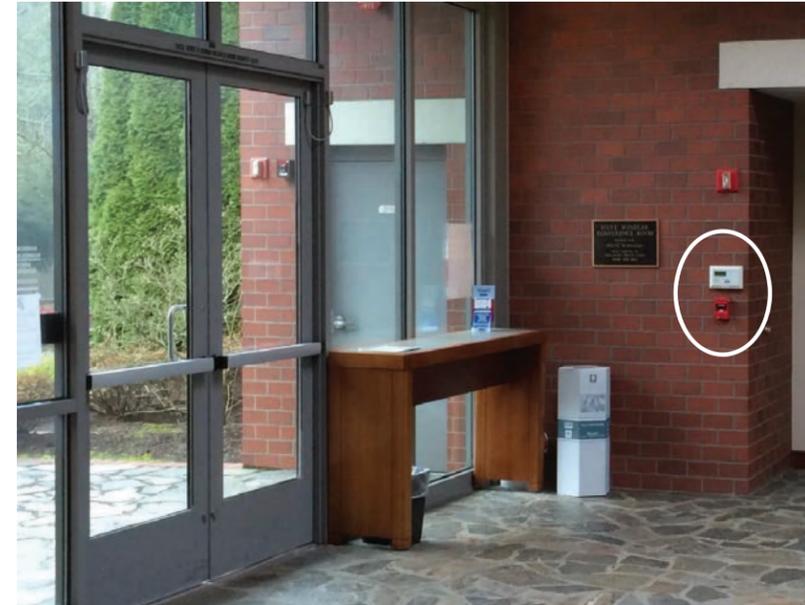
Fire alarm pull station and system panel adjacent to entry door
